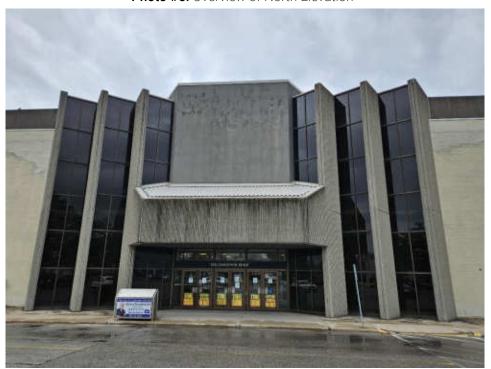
Typical Building Entrance (East). Note Precast Wing Walls, EIFS, and Glazed Assemblies
